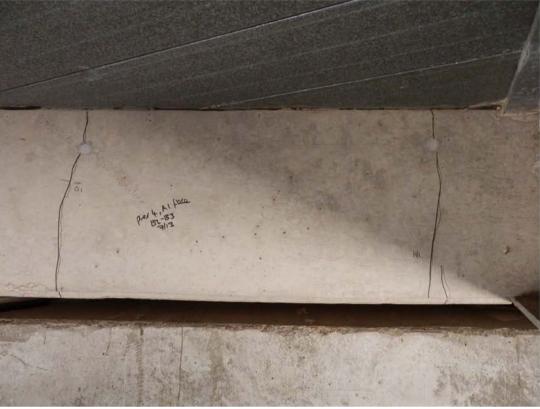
Pier 4 abutment 1 face diaphragm between beams 2 and 3. Vertical 0.1mm cracks from bolt hole formers for the original shuttering. (Taken: 31-Jul-2013)
